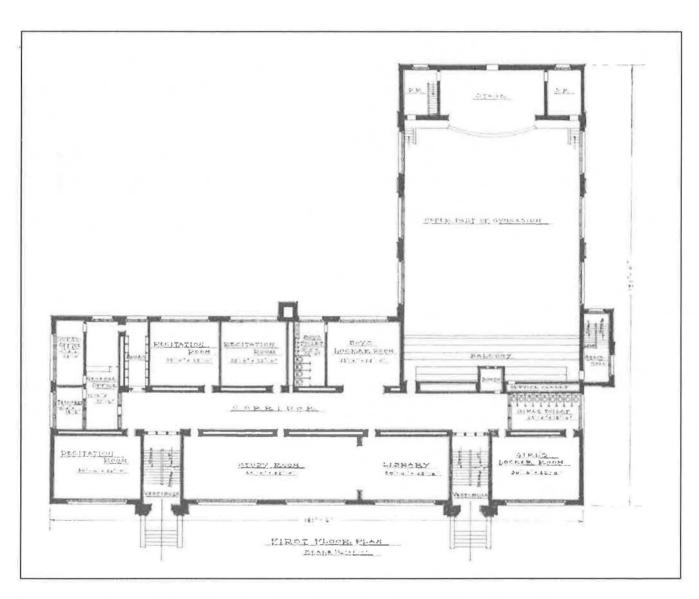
First Floor Plan from Twenty-five Years of School House Planning
